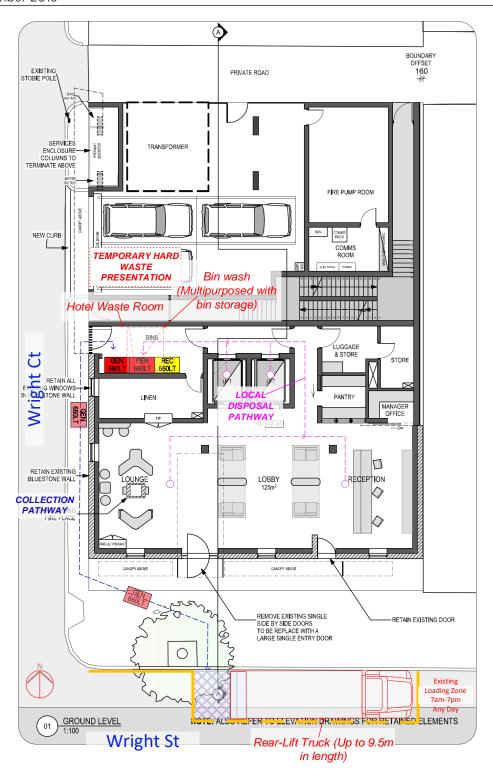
Site plan showing waste management system details. GEN = General Waste, REC = Dry Comingled Recycling.
